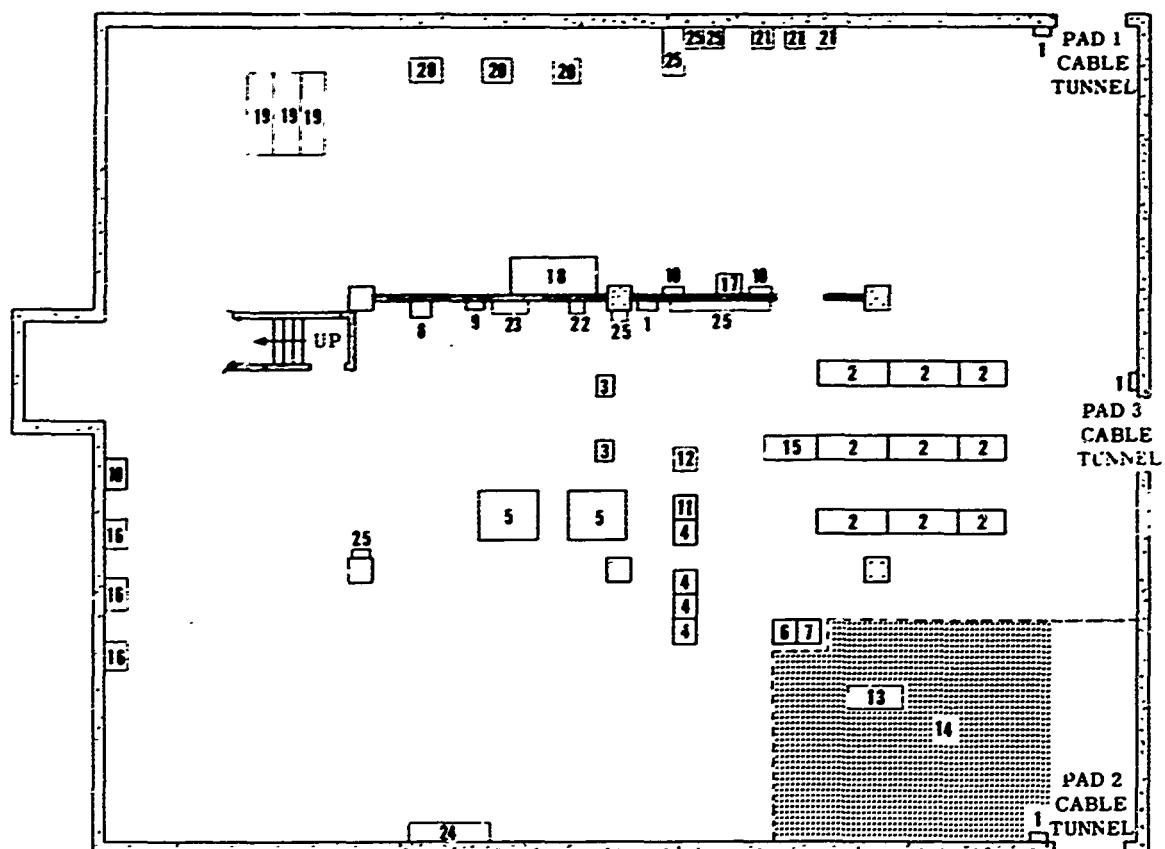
Launch Operations Building (LOB) Floor Plan
